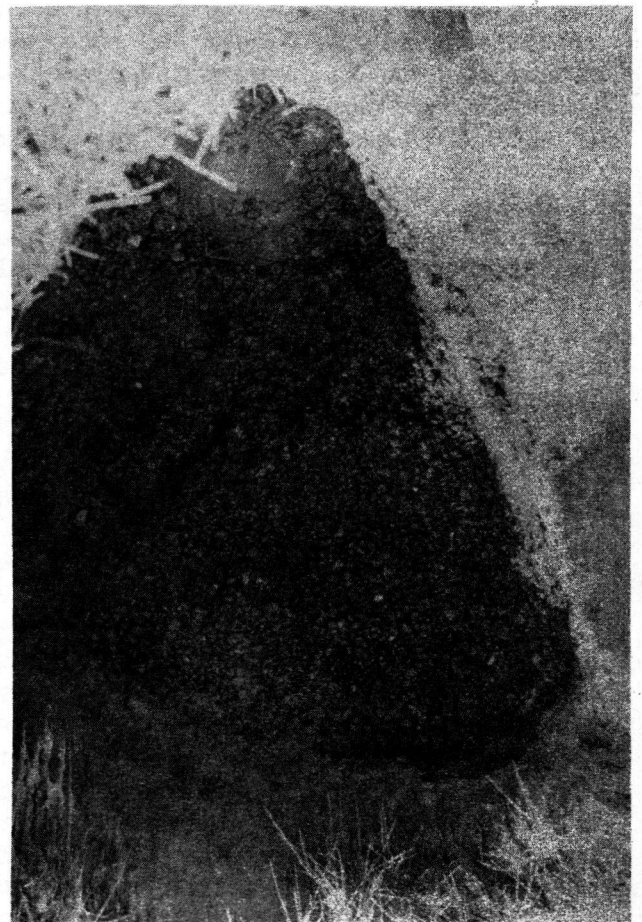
VERTICAL FACE OF #46 POROUS BACKFILL OVER PIPE. NOTE HEAVY SILT CONTENT FOR APPROXIMATELY 8" OVER PIPE.
